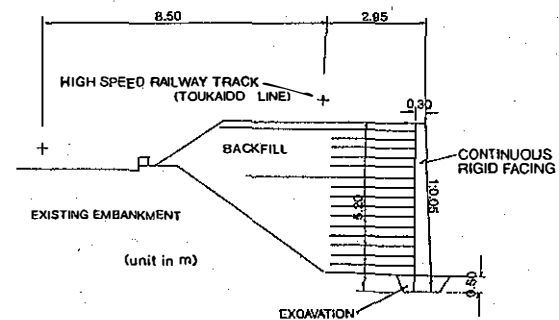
Typical railway embankment slope reconstructed by the proposed GRS retaining wall system, Amagasaki.
